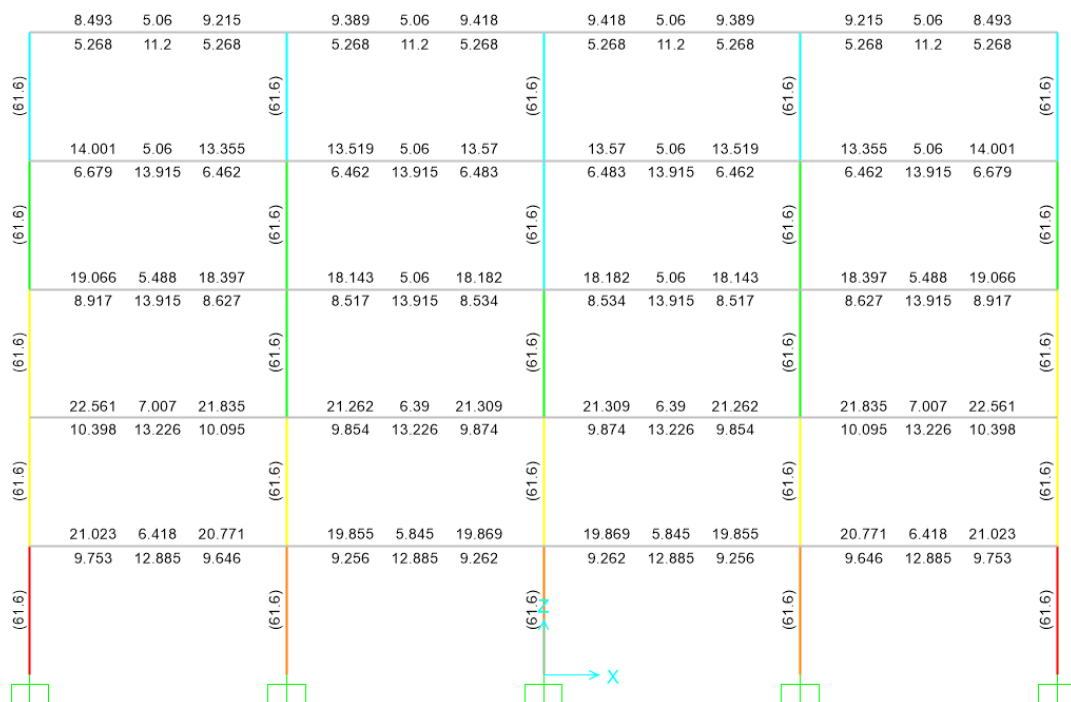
Check of demand/capacity ratio for columns in the central longitudinal frame, required amount of rebars in beams (in cm^2).
